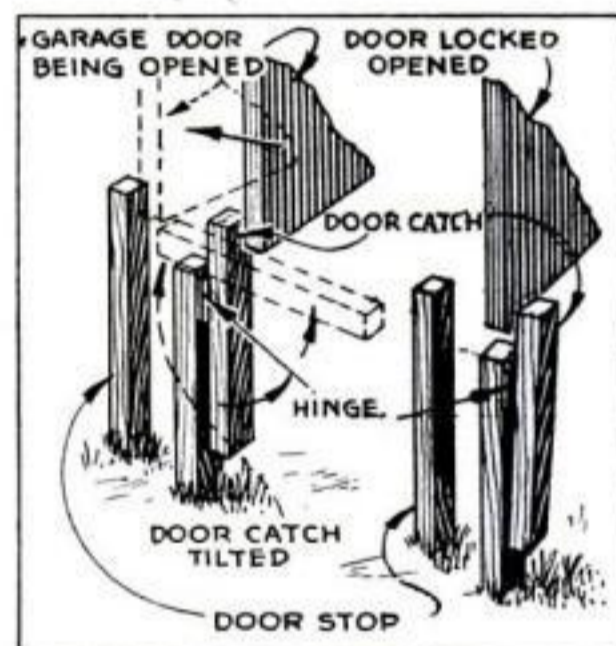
Hinged sticks set at side of garage door, as shown above, will make a simple door stop.
